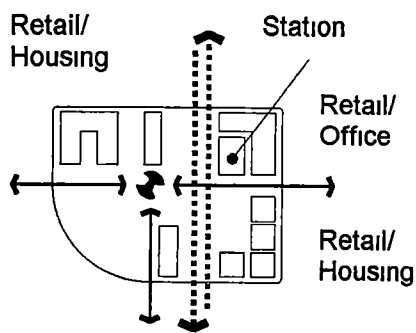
Proposed site plan – Central Station, Memphis, Tennessee.
